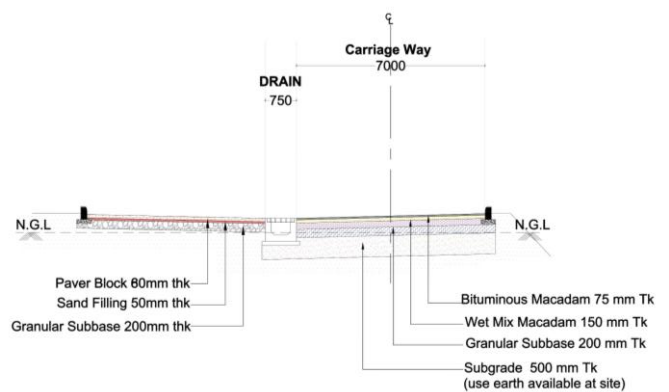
Prototype of service access road with 7M width with trench for storm water drain collected from the roads and the parking area provided with 2.5% to the drain.
